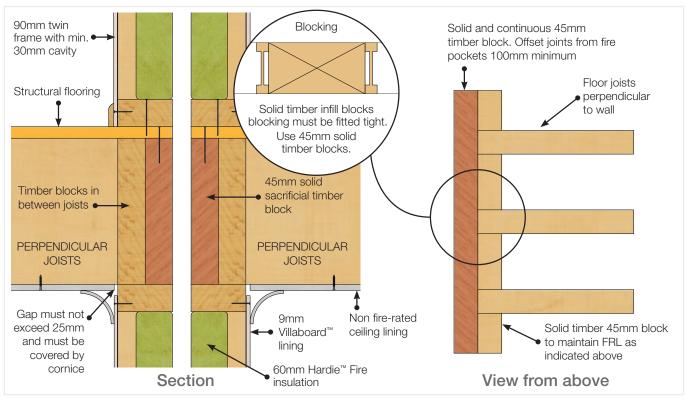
HARDIE™ SMART INTERTENANCY WALL SYSTEM DISCONTINUOUS WALL FLOOR JUNCTION (OPTION 1)
